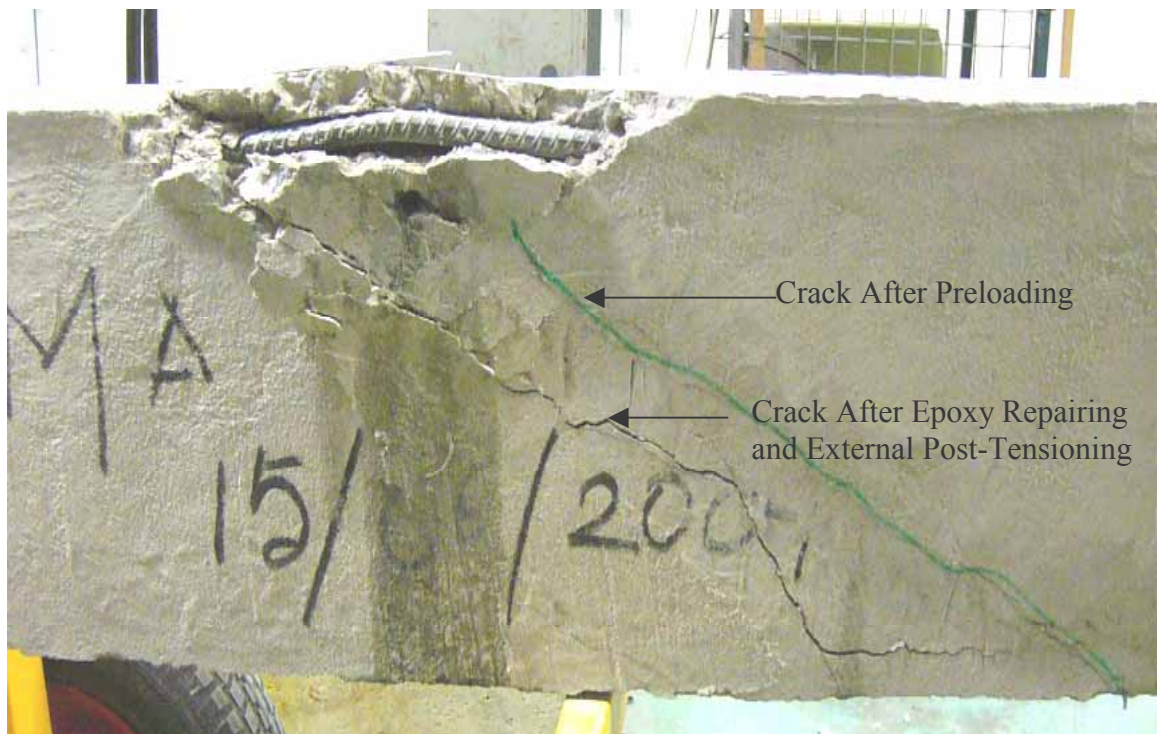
Failure Crack Pattern of Beam 4 after applying Epoxy and Prestressing
